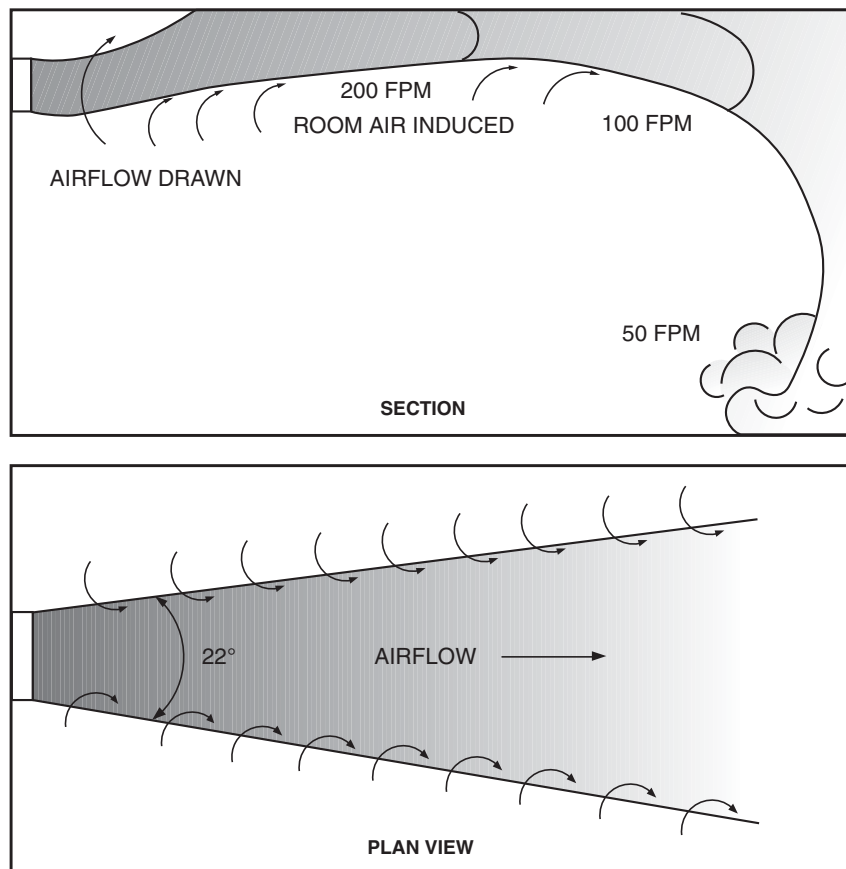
A Jet of Ventilating Air from a Wall Outlet a Few Inches Below the Ceiling.
